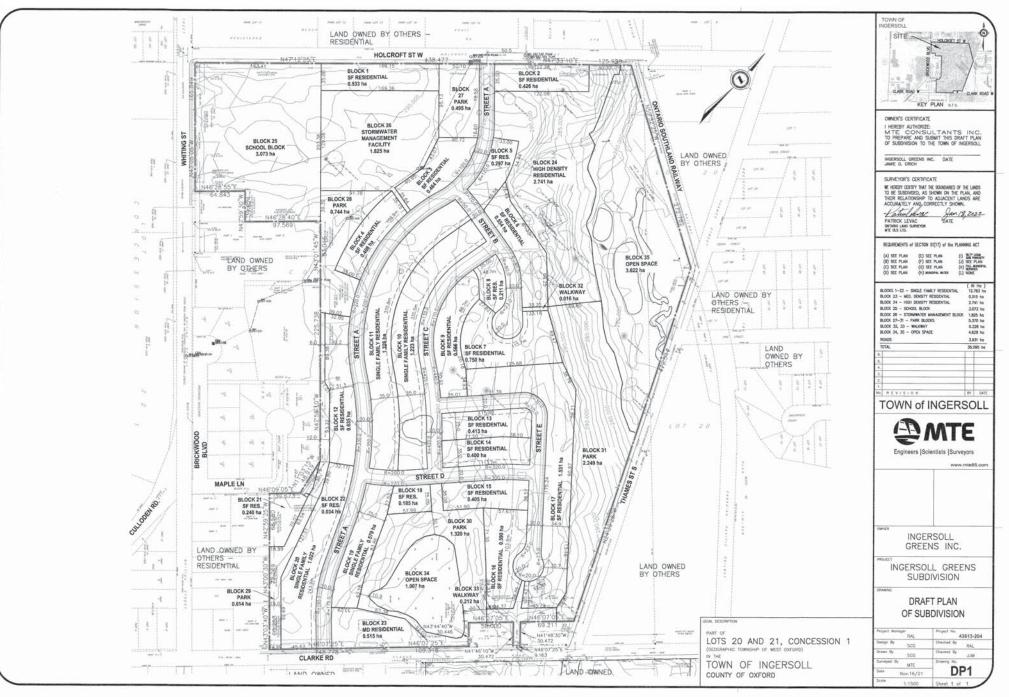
Previous Draft Plan of Subdivision File Nos.: OP 20-12-6; SB 21-04-6 & ZN 6-20-4, Part Lots 20 & 21, Concession 1 (West Oxford), Town of Ingersoll
